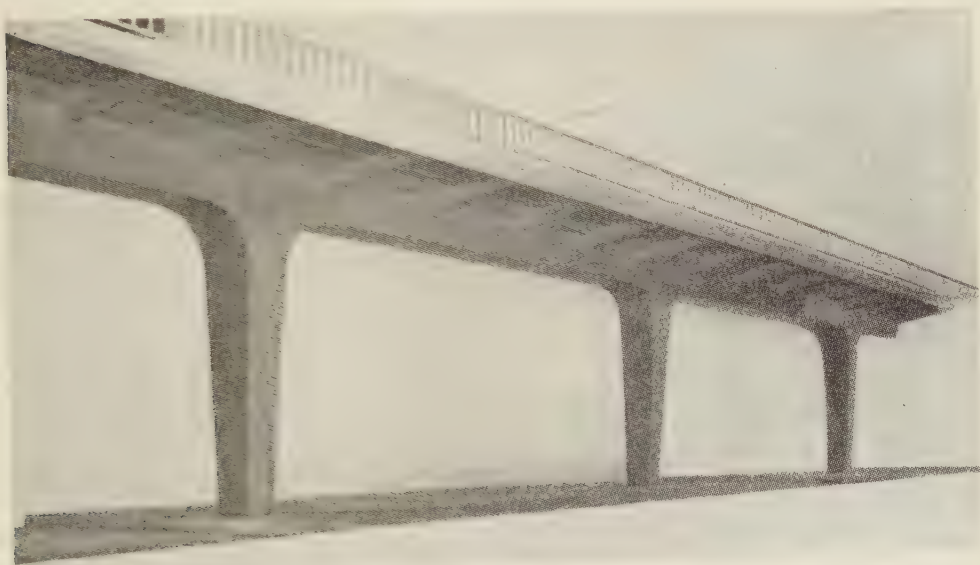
View of the new bridge for widening the bridge over the Kettwiger Strasse at Essen (photograph of model).
